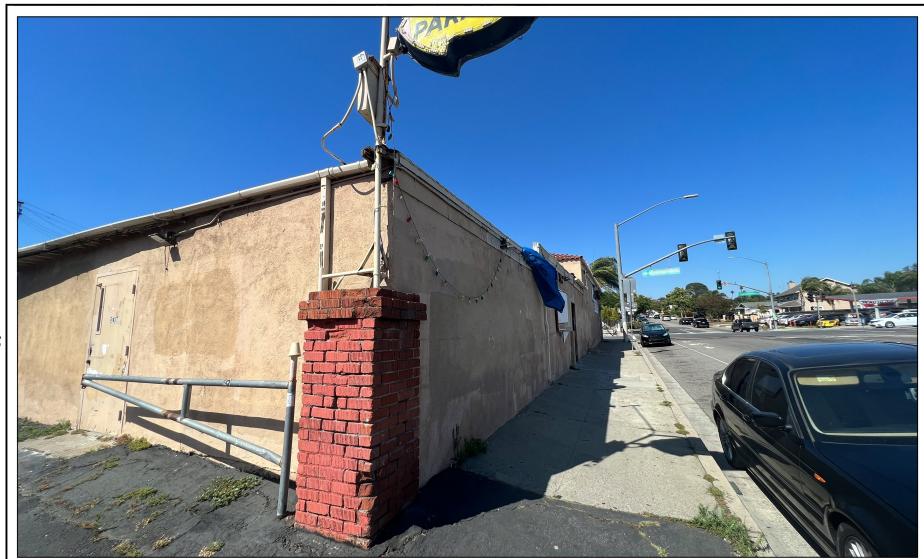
Southwest Corner of the 849 South Escondido Boulevard Building, Facing East
